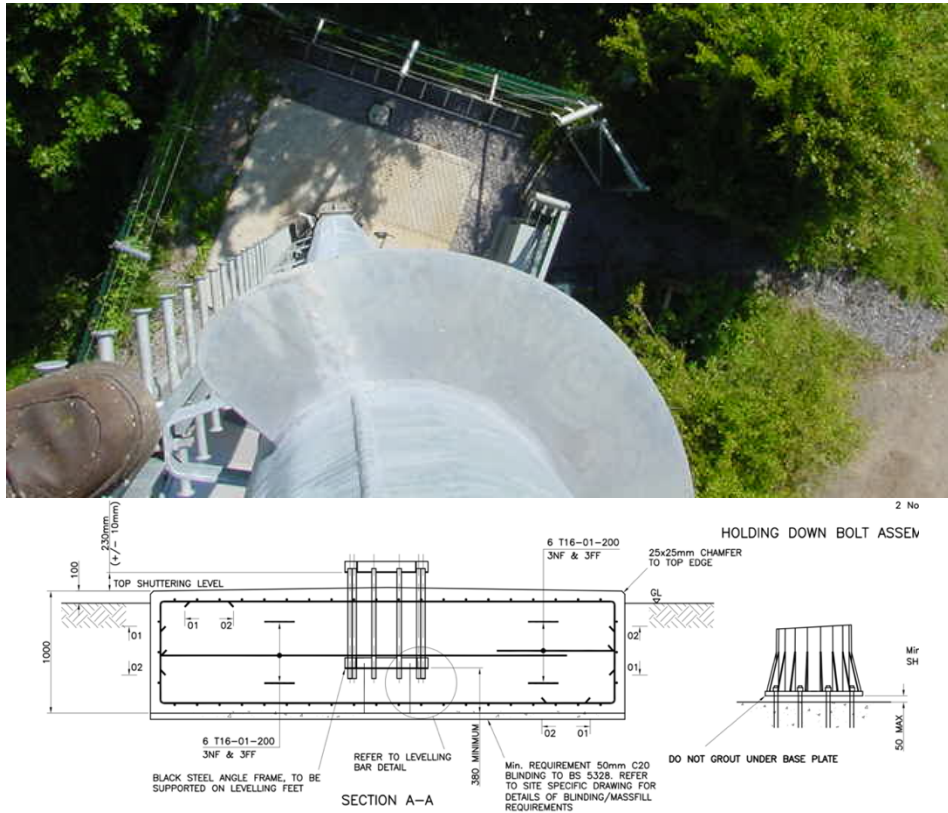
Typical footing foundation for monopoles and short lattice towers.
